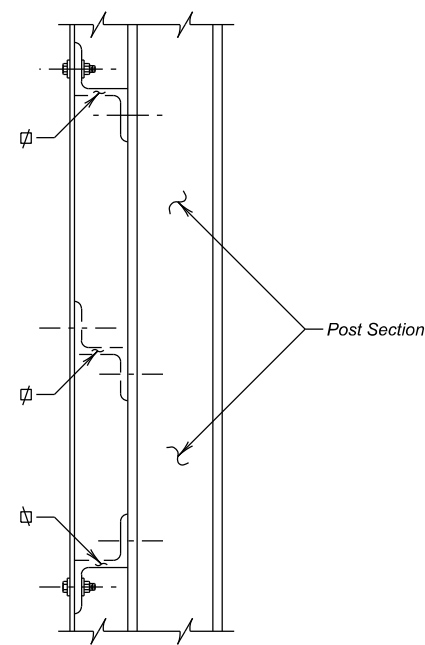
DETAILS FOR MOUNTING SHEET ALUMINUM SIGNS ON STEEL FLANGED POSTS
